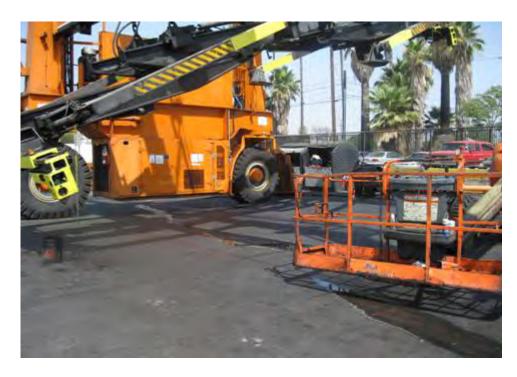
Proposed shoofly track area facing west from Mount Vernon Avenue Bridge.
